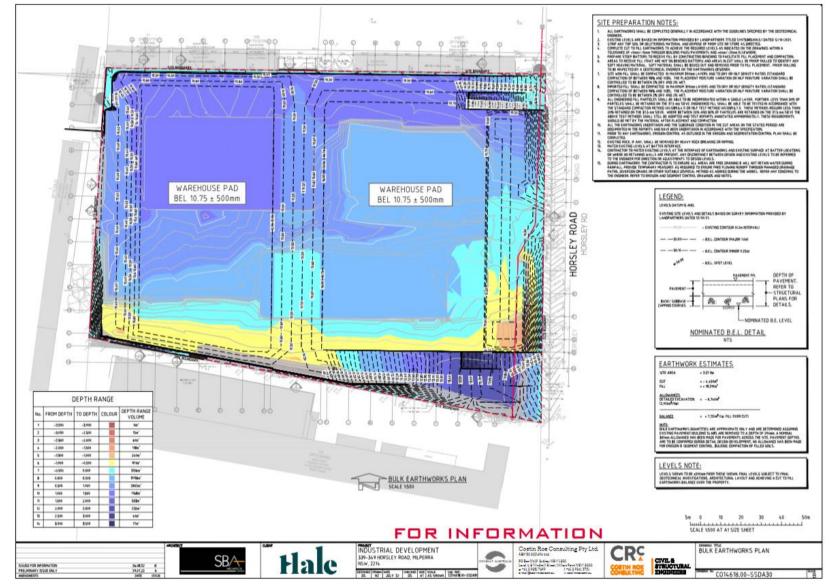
Proposed Bulk Earthworks Plan (Source: Costin Roe Consulting, 2022)
